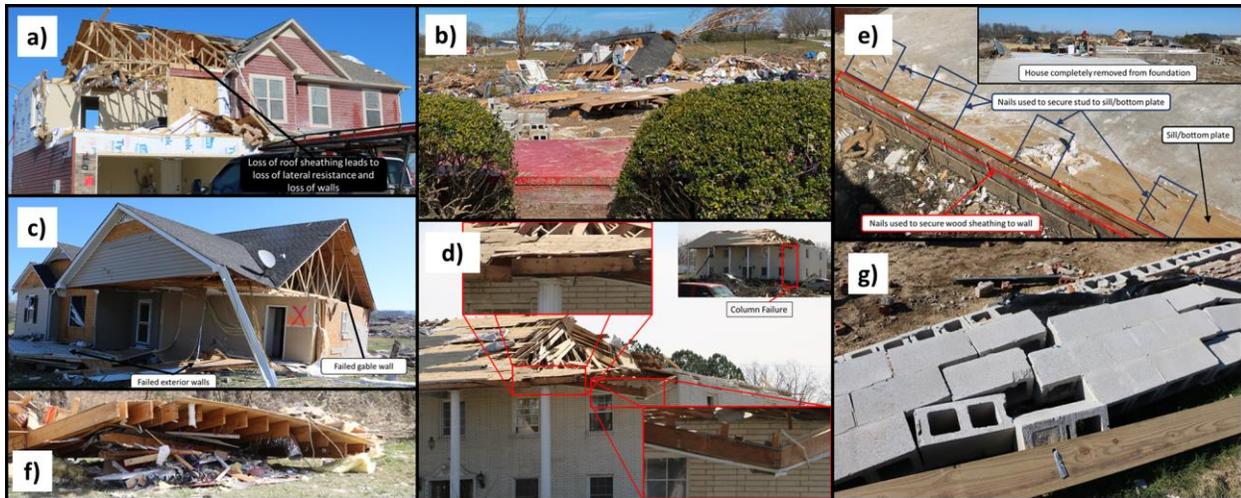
Observed damaged from Cookeville Tornado. a) roof sheathing loss, b) wall collapse, c) wall failure, d) porch beam failure, e) wall detachment from bottom plate, f) floor system detachment, g) stem wall collapse.
